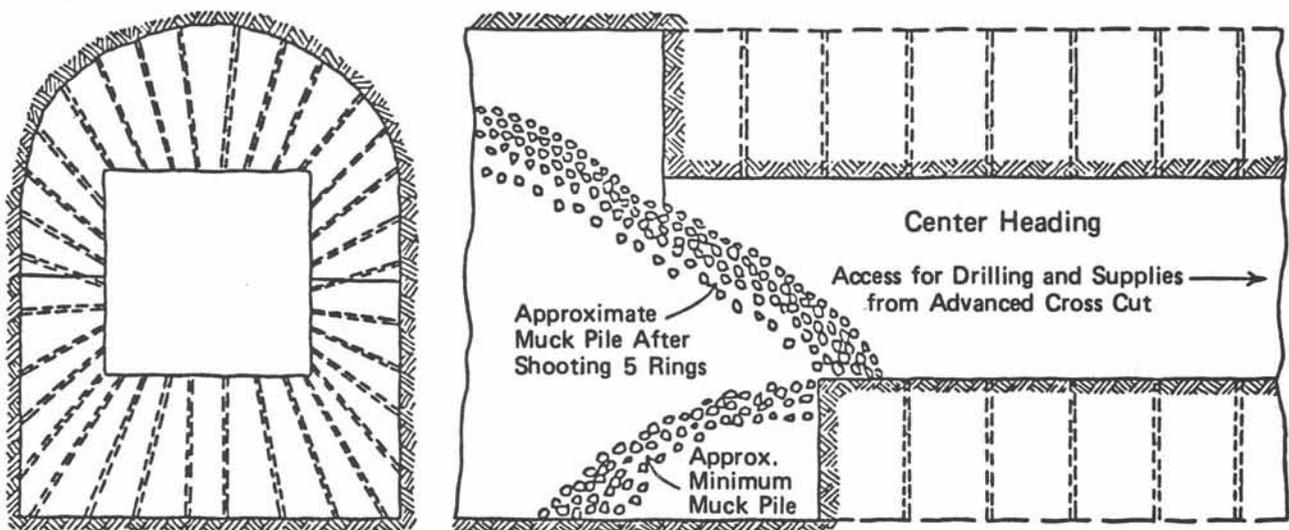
Excavation by ring drilling from center heading. From Baxter (1932) by permission, American Society of Civil Engineers.
